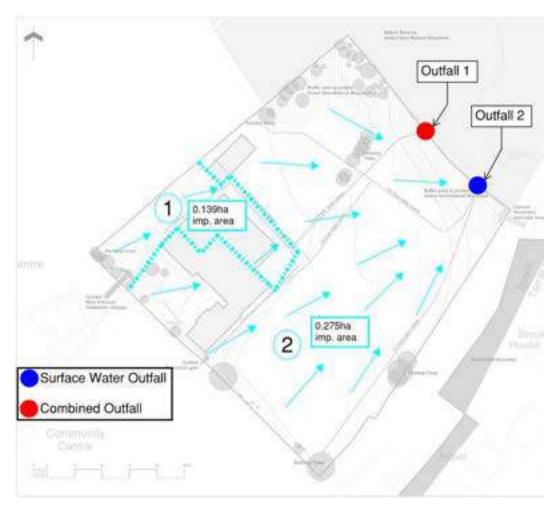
Llanilltud Faerdref storm/combined drainage outfall points and catchment
